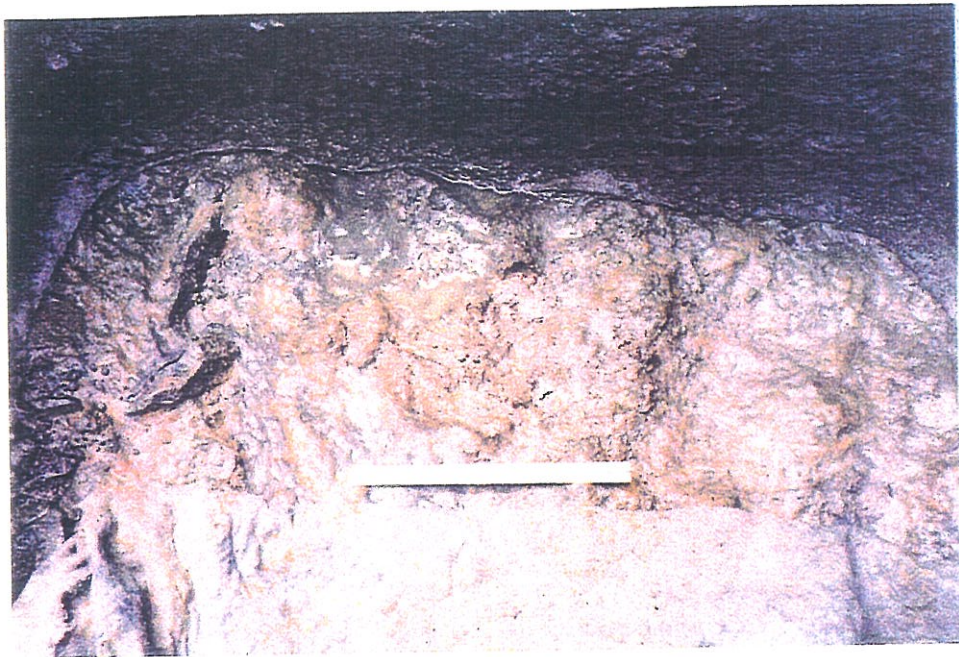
Geotextile folded back exposing the subgrade surface, west side.
